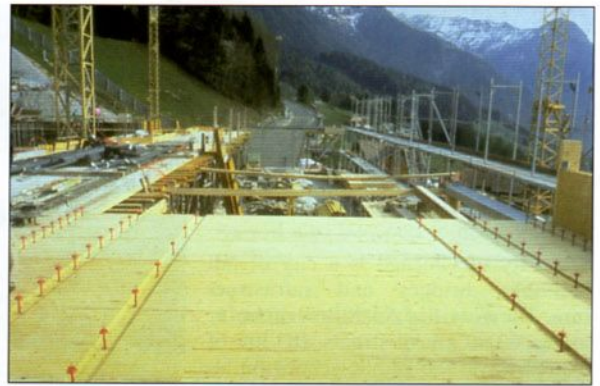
Timber-concrete composite slabs for a building in Triesenberg
